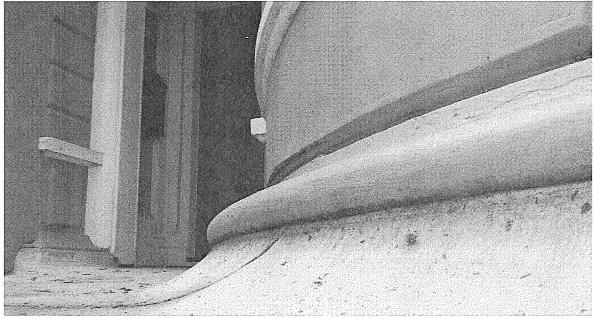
Detail of curb termination at wood trim (beneath area of soft deteriorated wood).
